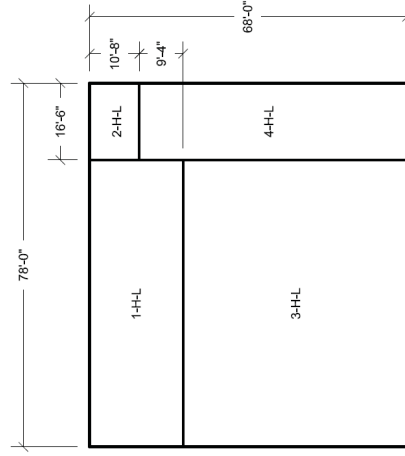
H.6-68: PUMP HOUSE WEST WALL LOOKING EAST
